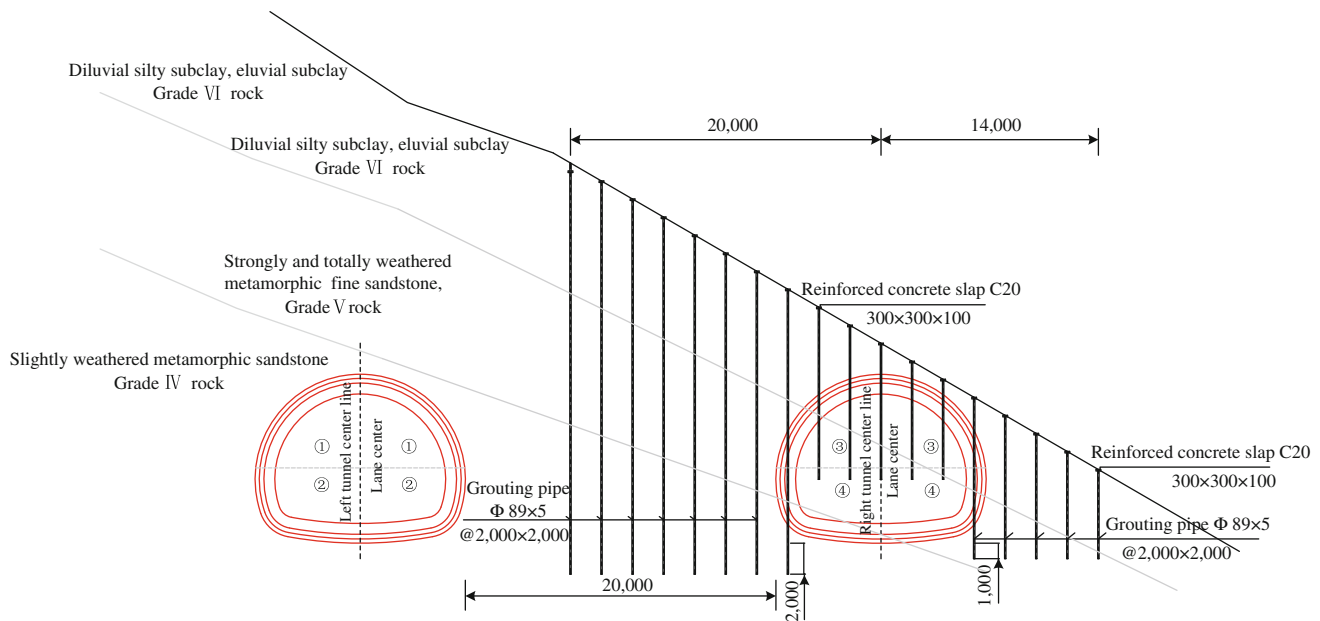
Geological transection of an ultra-shallow tunnel in entry portal section (unit: mm)
